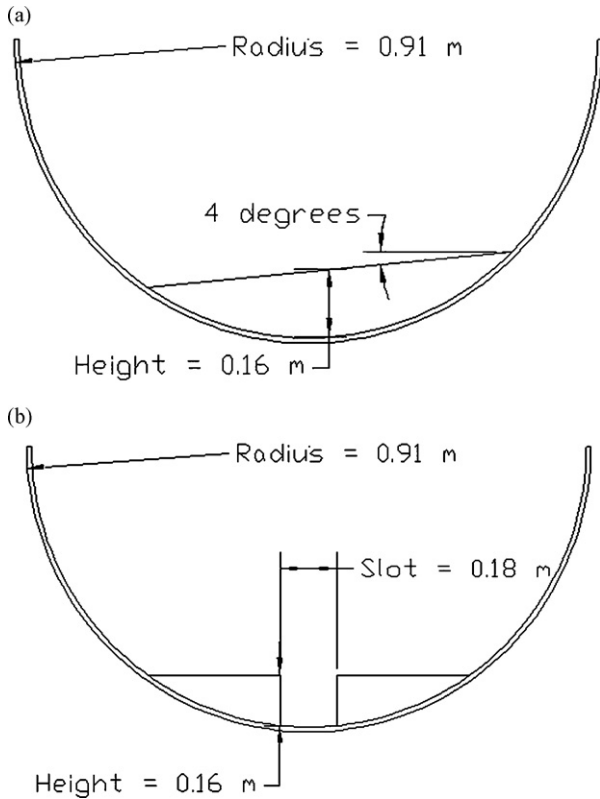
Culvert cross-section with the installation of (a) sloped-weir baffle and (b) slotted-weir baffle. Both views are looking downstream.
